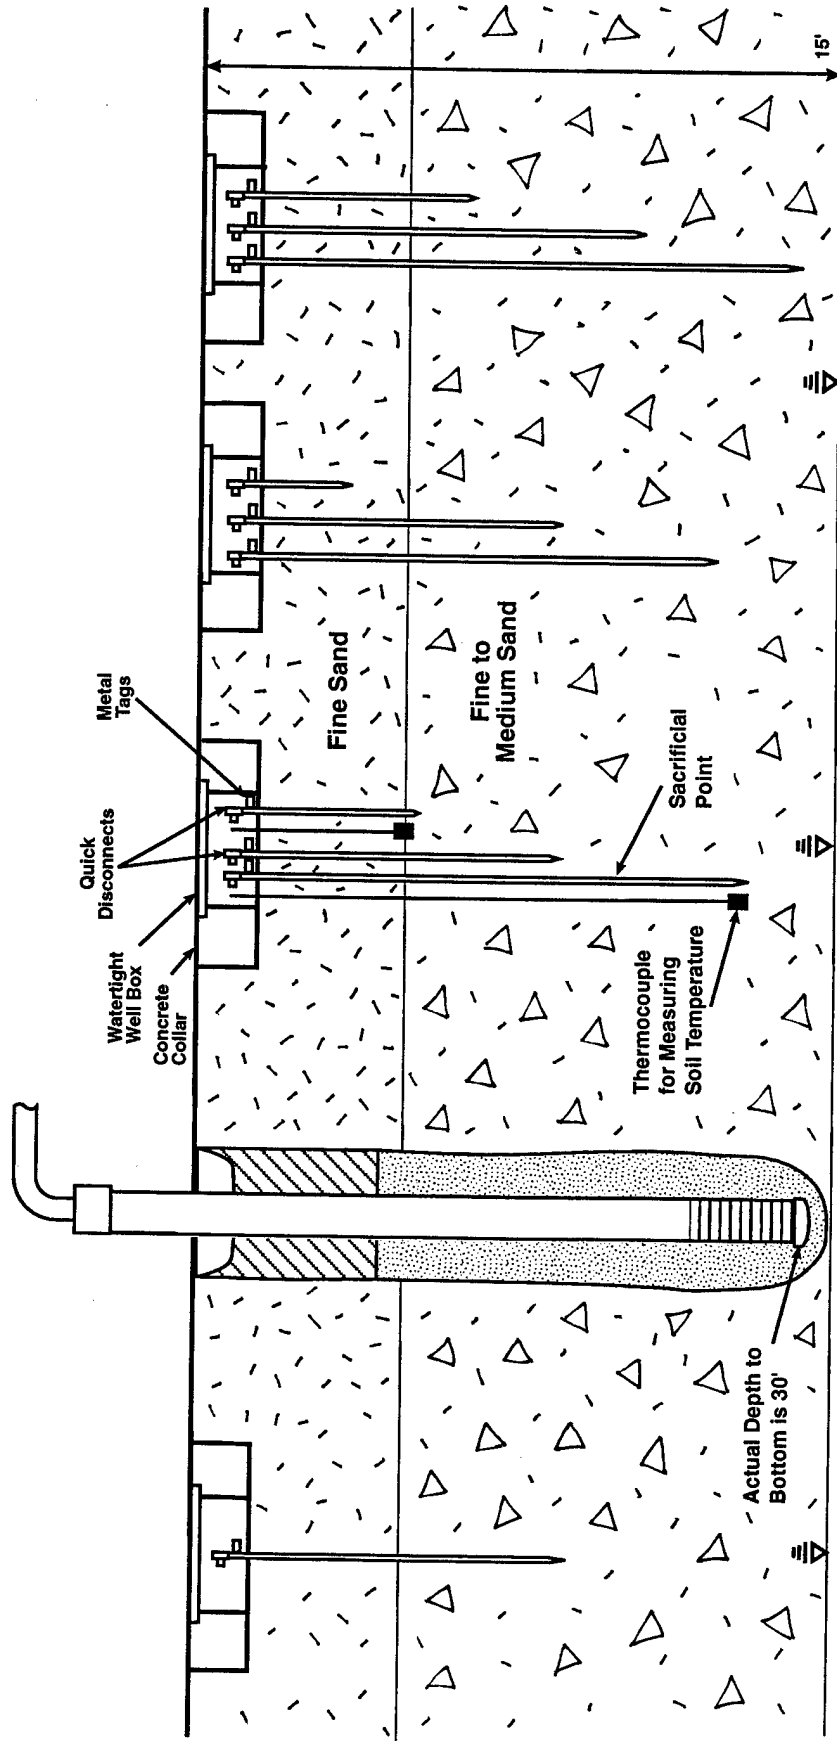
Cross Section of Vent Well and Monitoring Points at Buildings 7701 and 7705 Site Showing Site Lithology and Construction Detail (not to scale)
